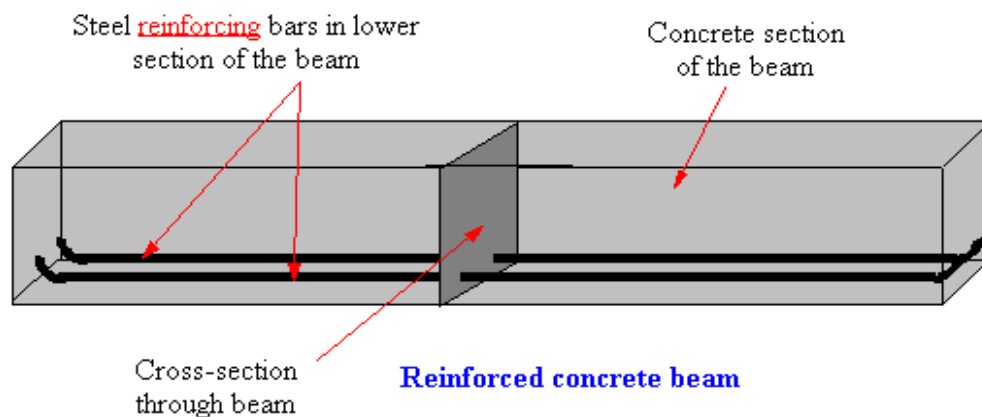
Beam cross section and reinforcing steel for positive moment
